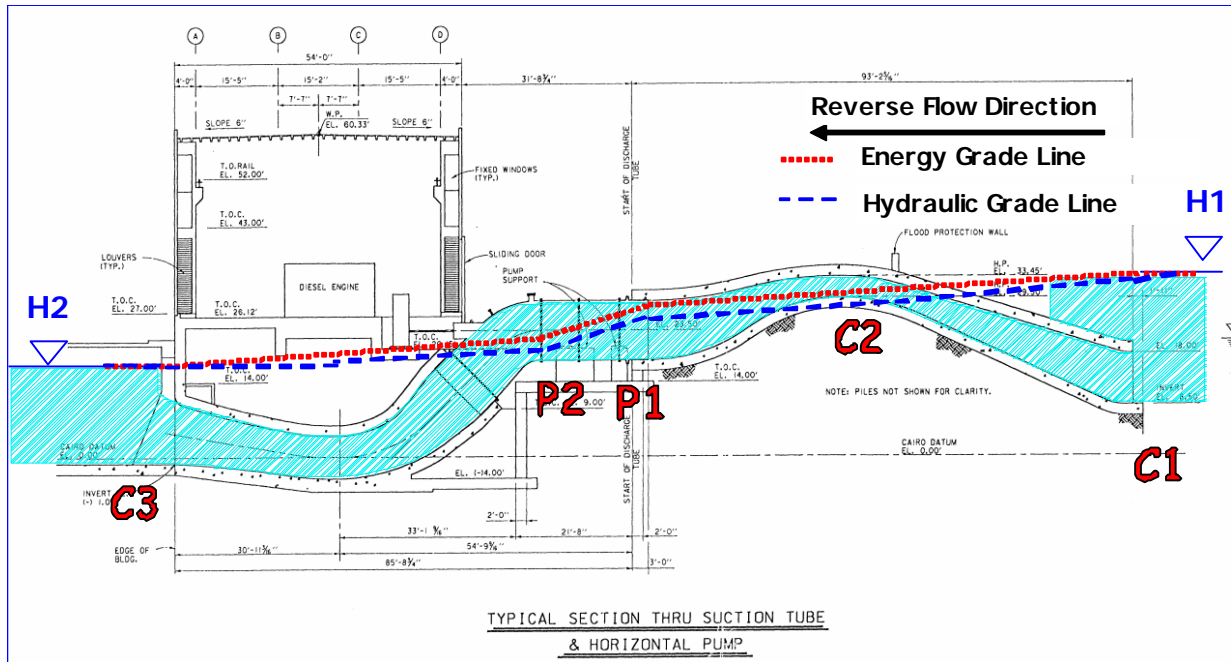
Typical Hydraulic Profile for Primed Conduit Reverse Flow with EGL and HGL
